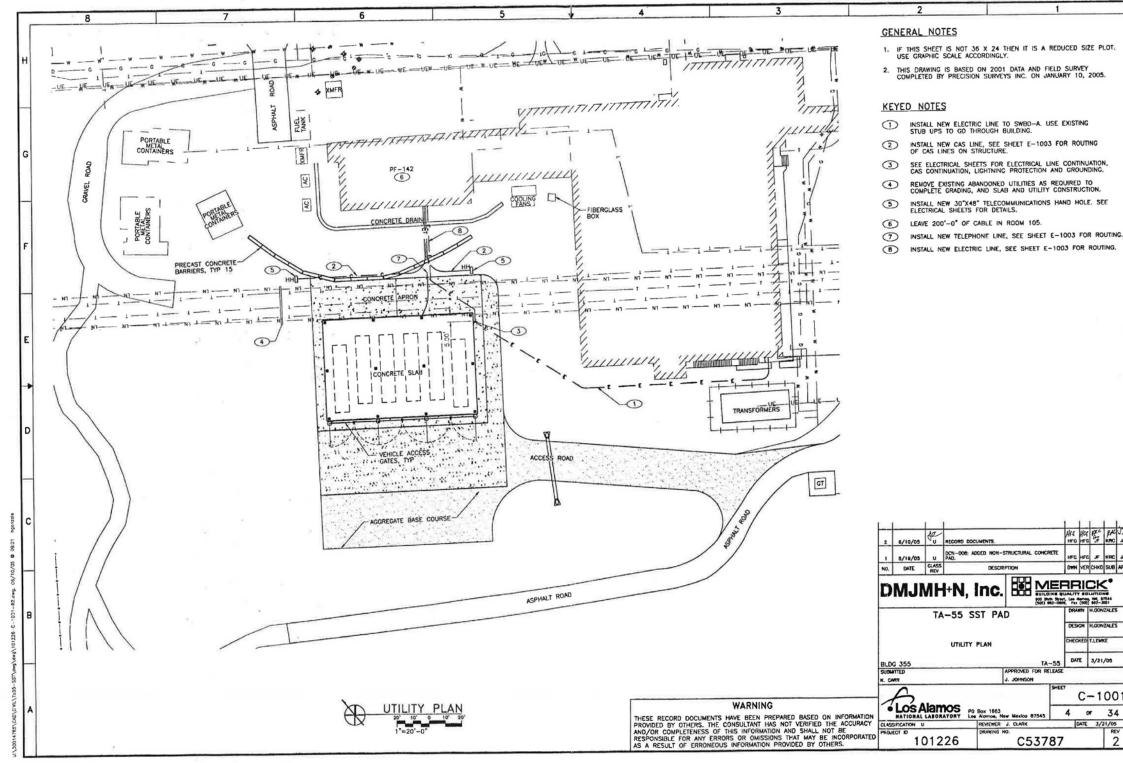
TA-55-0355 Design Drawing (Concrete Slab Plan View)
